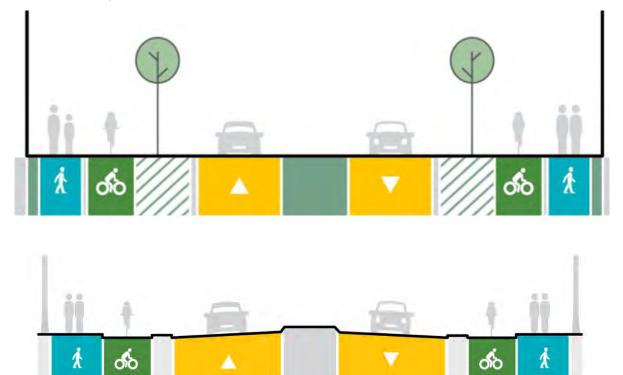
Spedding Road Upgrade Typical Cross Section – Corridor and Bridge
